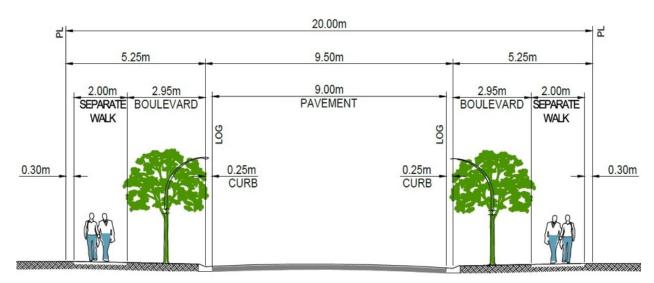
ROADWAY CROSS-SECTIONS (PROPOSED - LOCAL STREETS)
